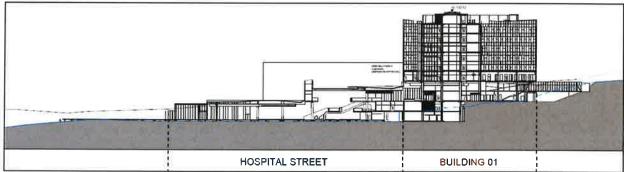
| Section running north-south through proposed building and hospital spine (Source: Applicant's RtS 2018)
